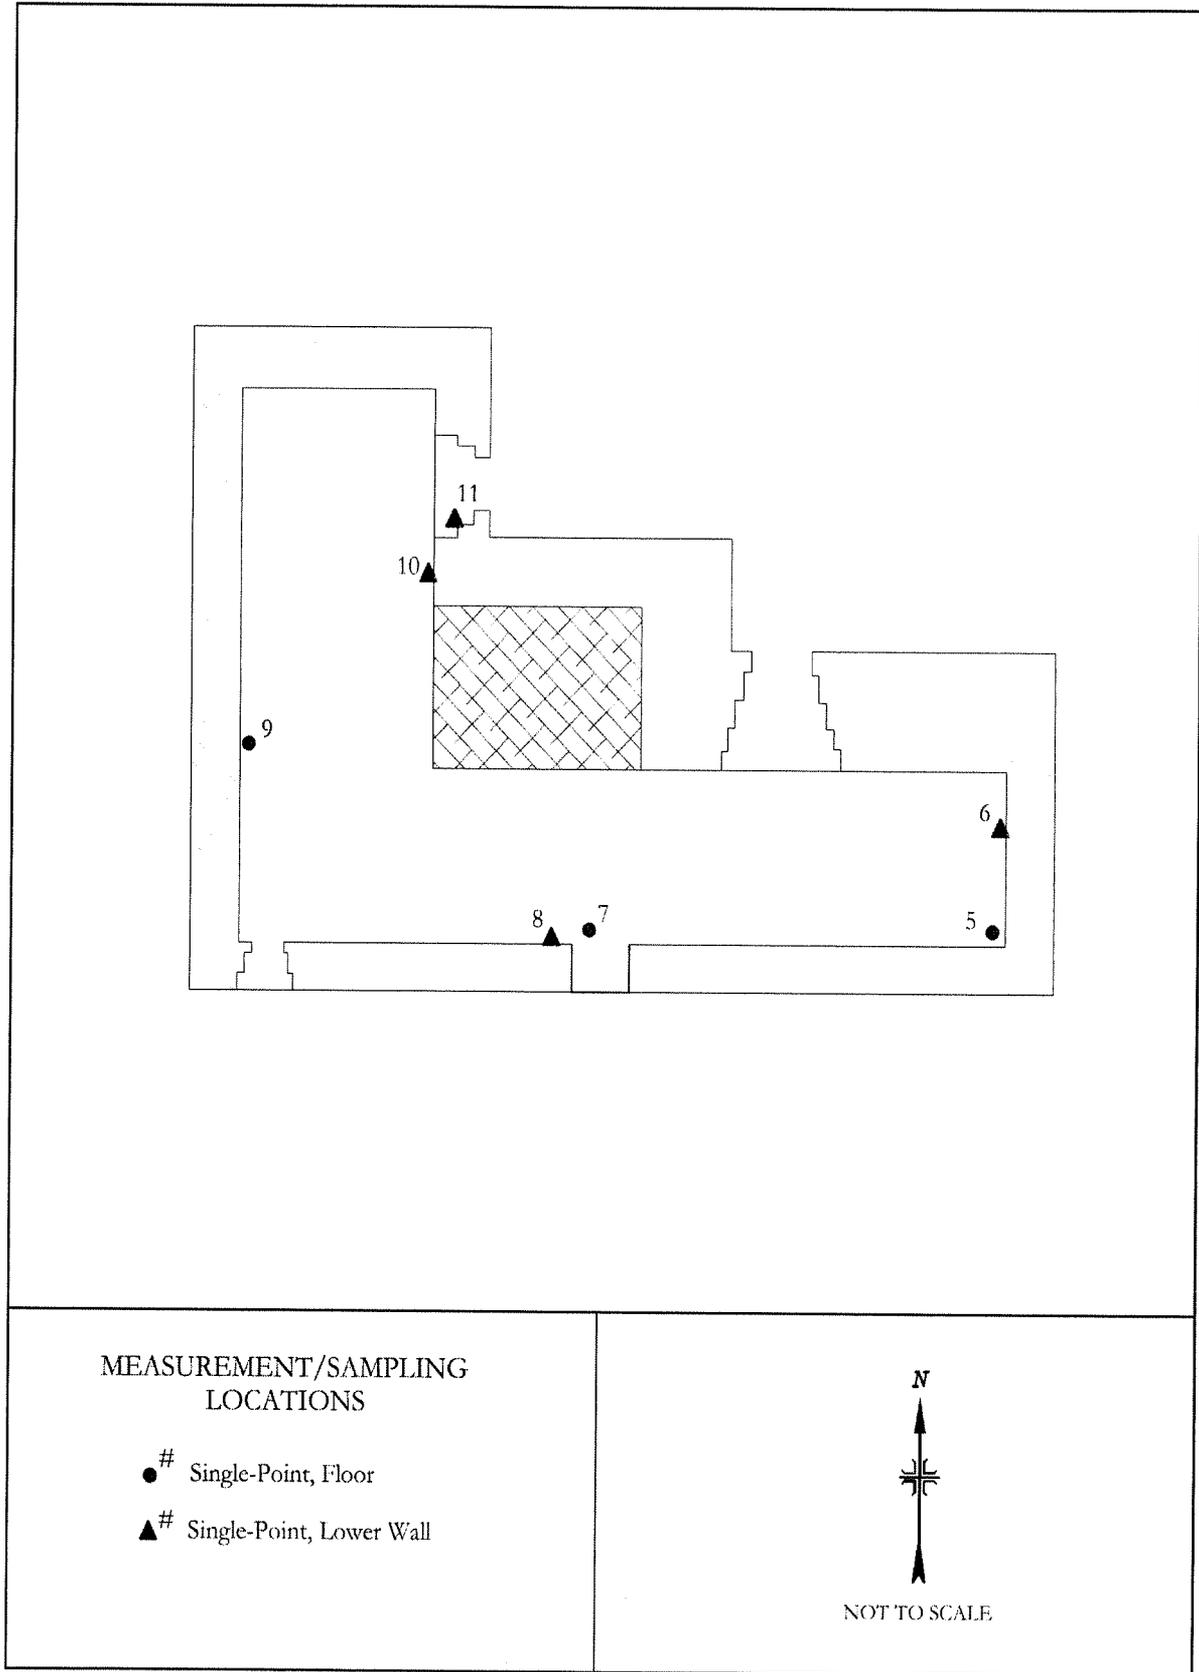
Auxiliary Building, Room 46 - Direct Measurement Locations
